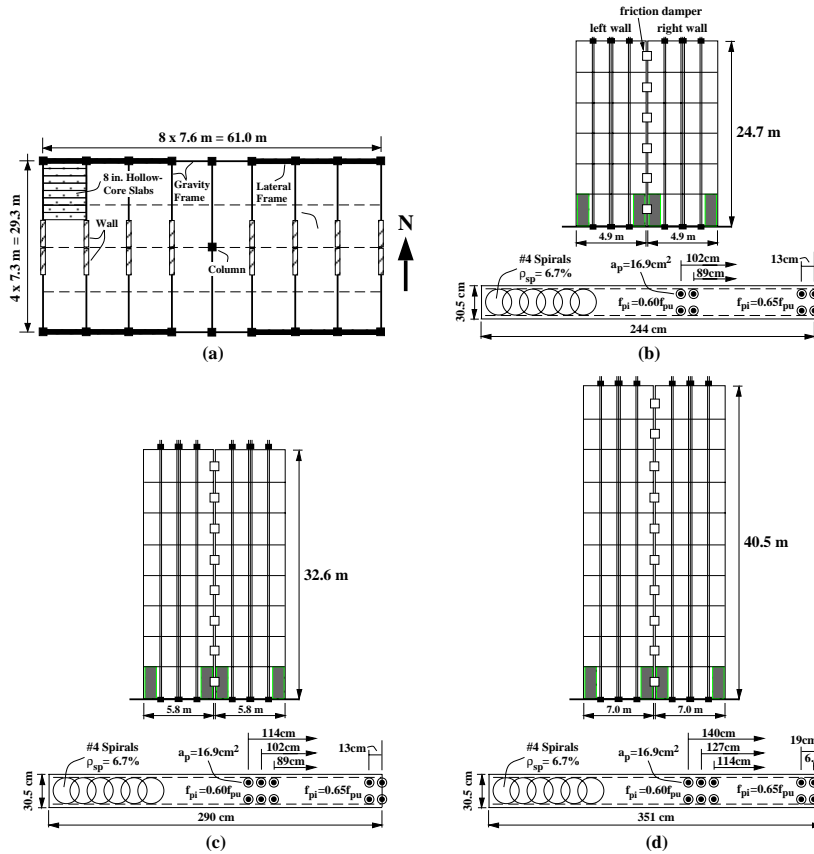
Prototype buildings: (a) plan layout; (b) Wall CW1; (c) Wall CW2; (d) Wall CW3
